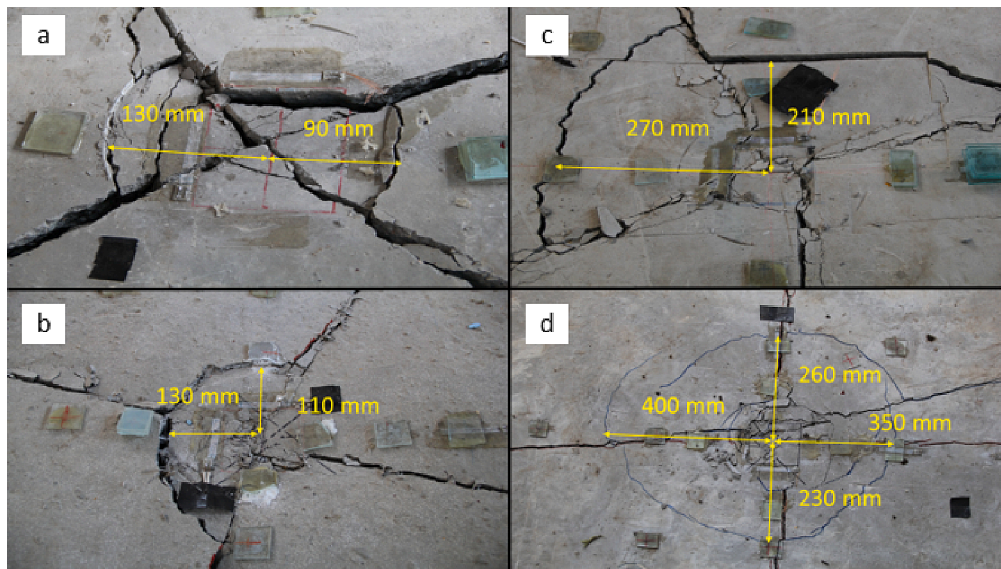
Distance between the periphery of cracks and centre point on the top surface of concrete slab: (a) plain concrete, (b) PFRC, (c) SFRC, and (d) SMRC.
